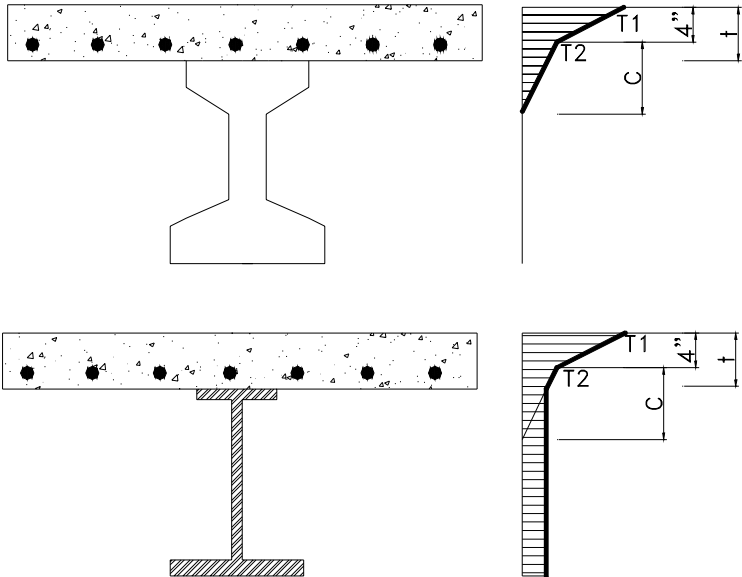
AASHTO temperature gradient profile for steel and concrete girders.
